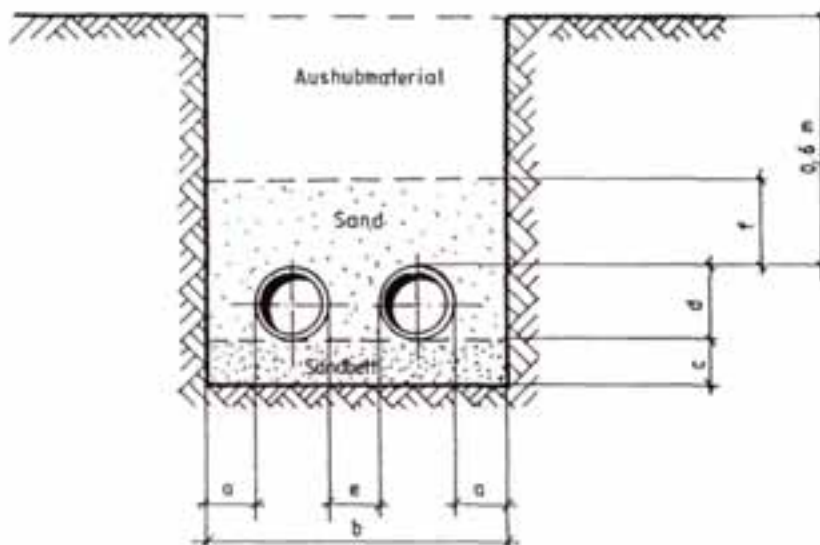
Construction of the Trench for Pipe Systems Laid in the Ground
